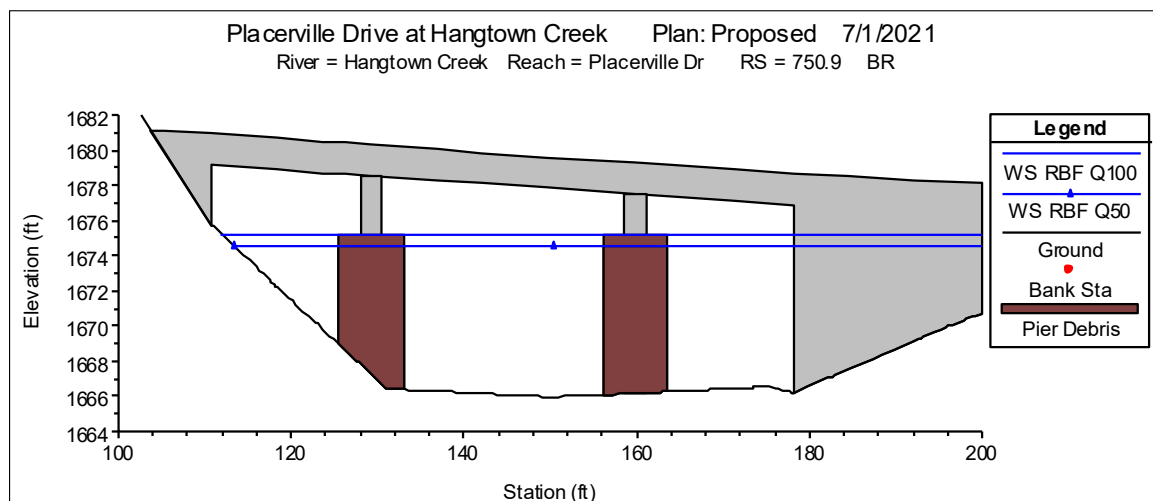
Proposed Bridge Cross Section (Facing Downstream)
